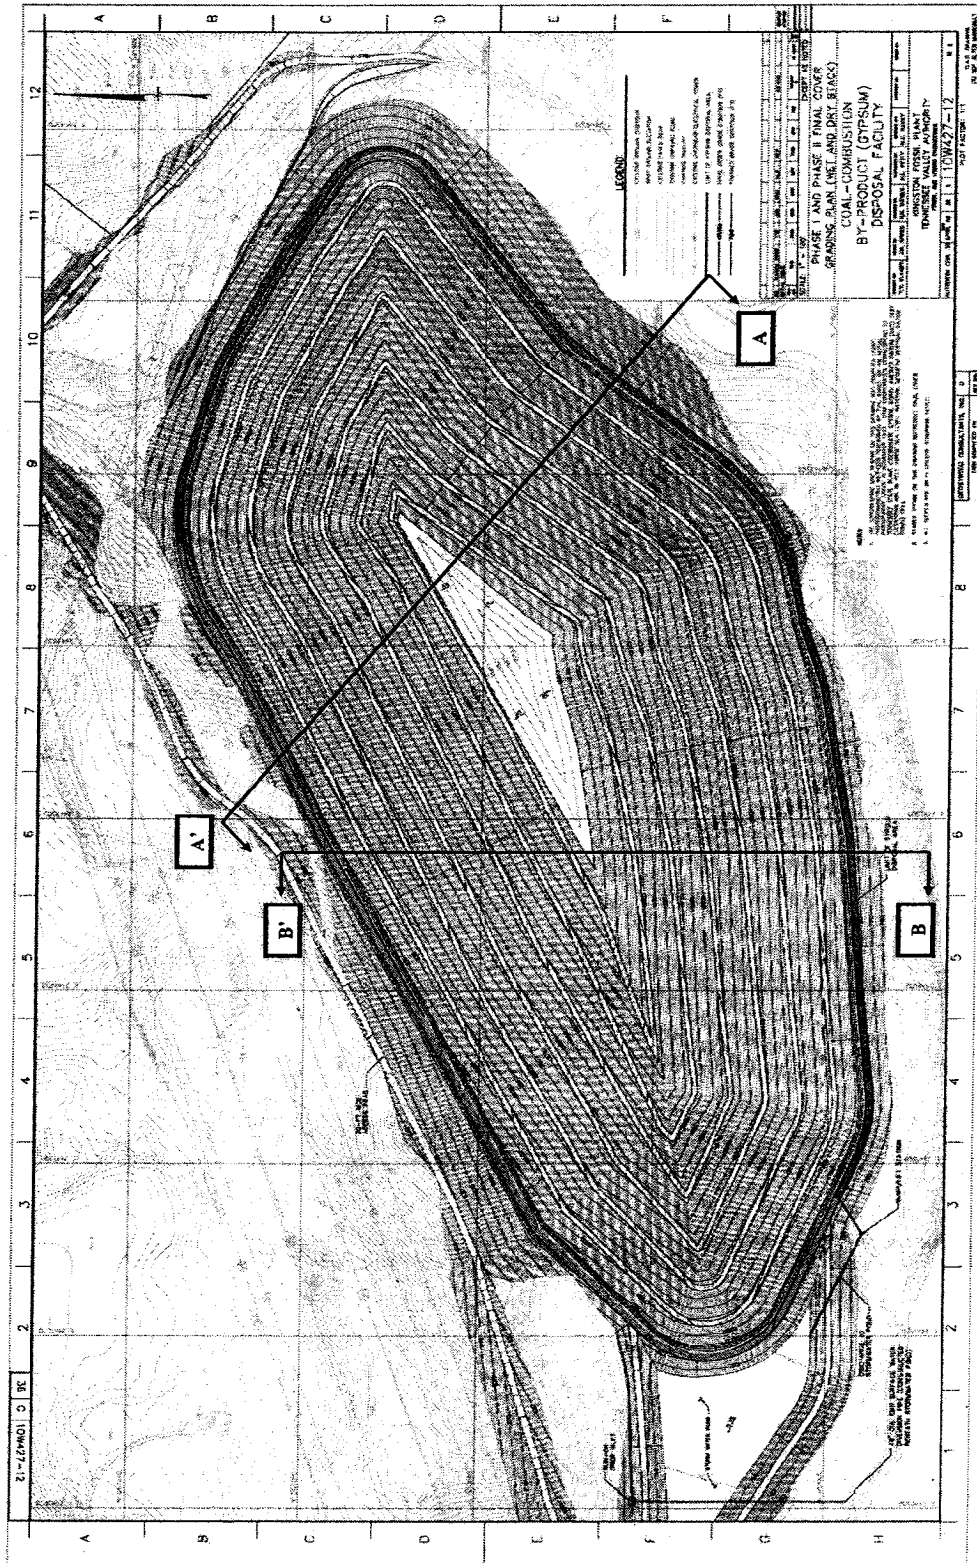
Location of the Analyzed Cross Sections on Final Cover Grading Plan.
